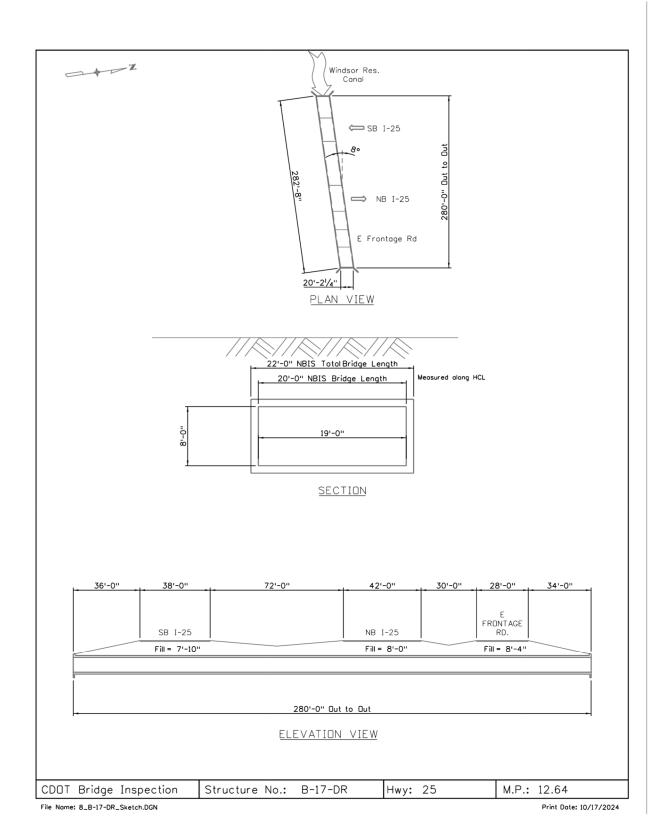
Culvert Inspection Sketch - Example 8
